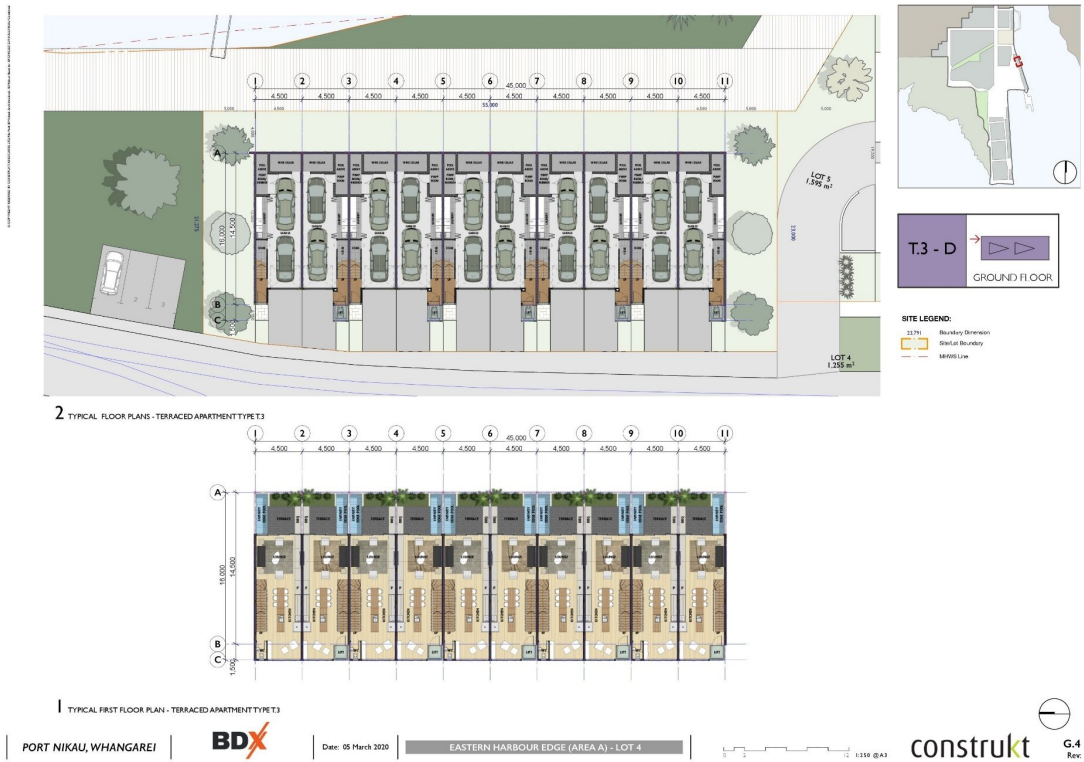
Part G – Eastern Harbour Edge (Area A) Floor Plans
